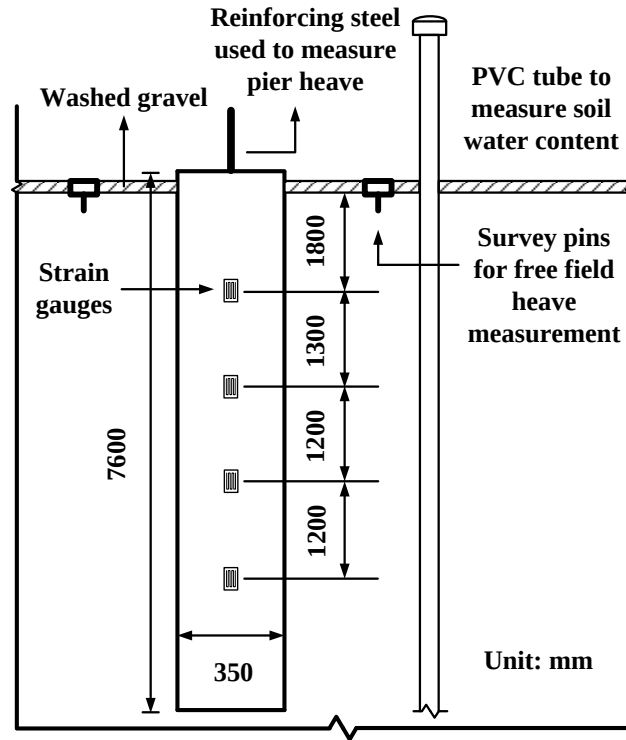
Diagram of the drilled reinforced concrete pier at CSU expansive soil test site (Modified after Benvenga 2005)
